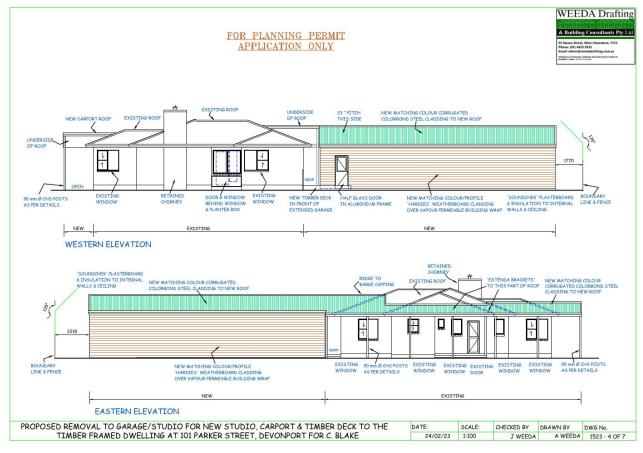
Elevations: 1 of 2 (Weeda Drafting)
